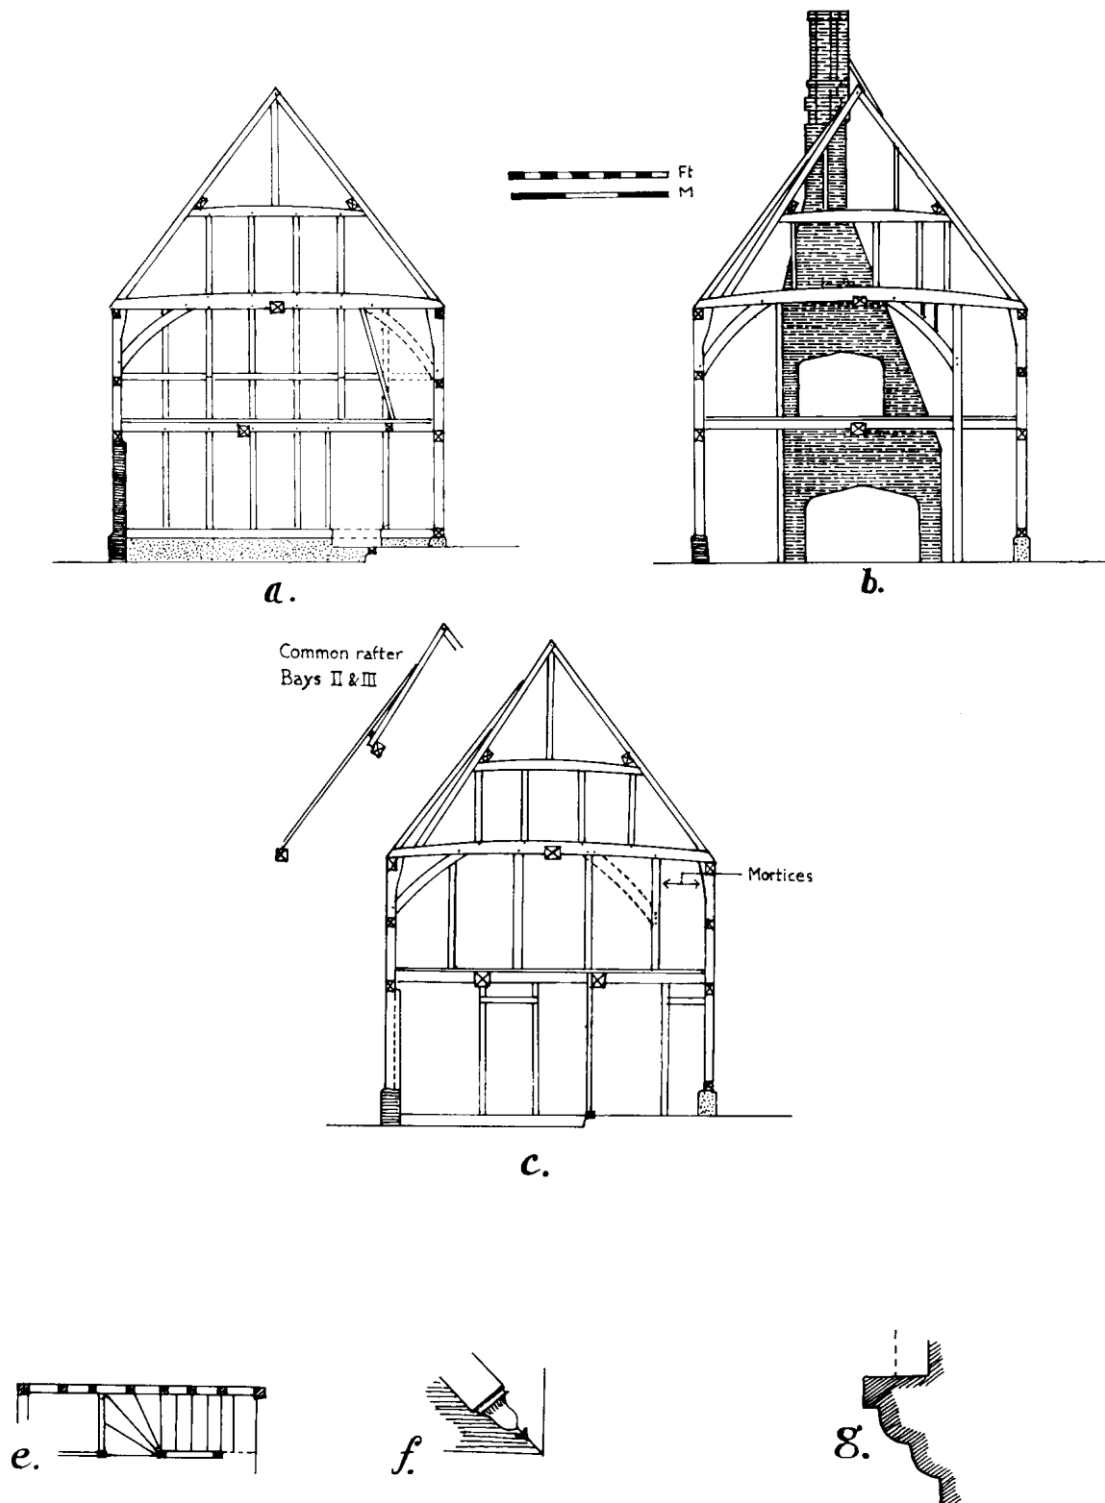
Bowers Farm, (a) Section at A-A, showing ladder-case in north-west corner of upper floor, (b) Section at B-B. (c) Section at C-C. (e) Original arrangement of staircase, (f) Detail of stop on bearer beams, (g) Section of first-floor fireplace jamb.
